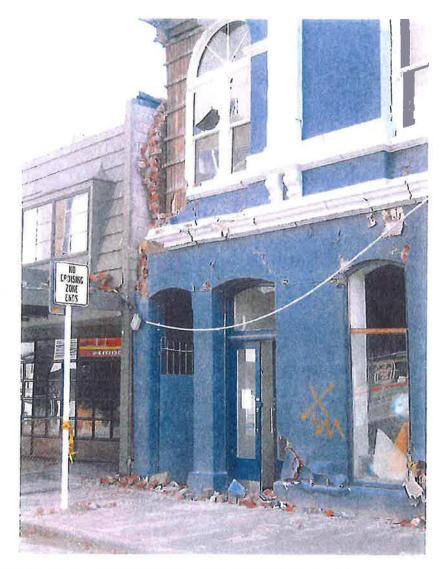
Corner of the building, showing collapse of the reinforced concrete parapet.
